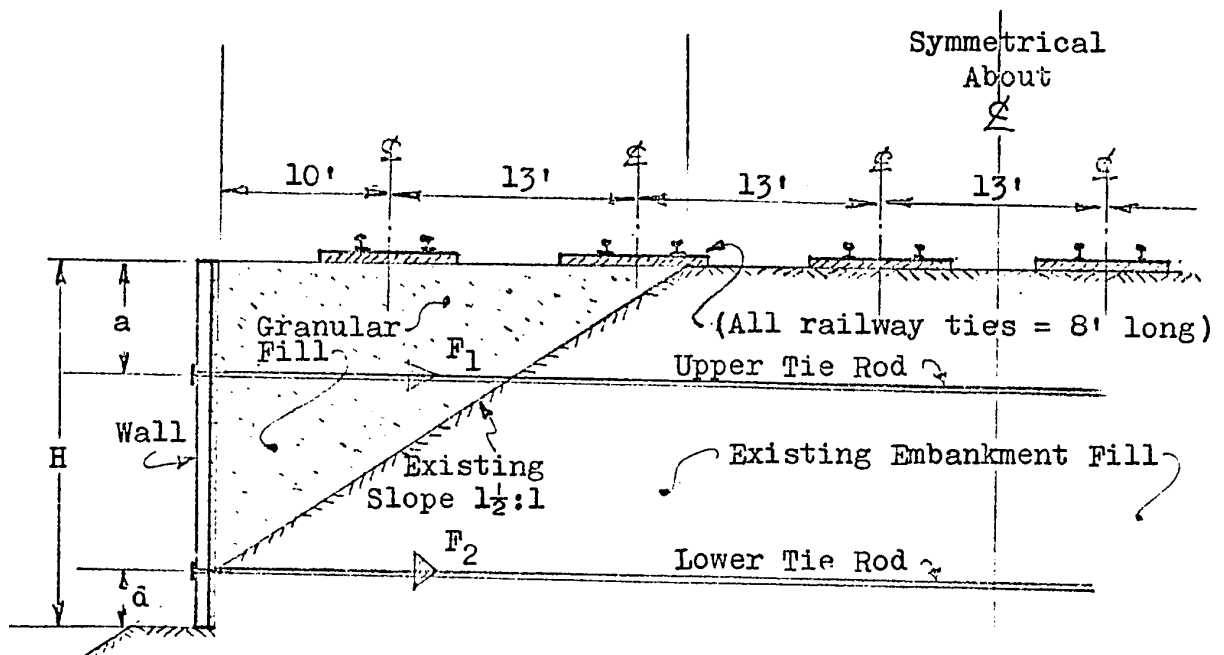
Cross Section & Dimensions of Railway Embankment with retaining wall system.
